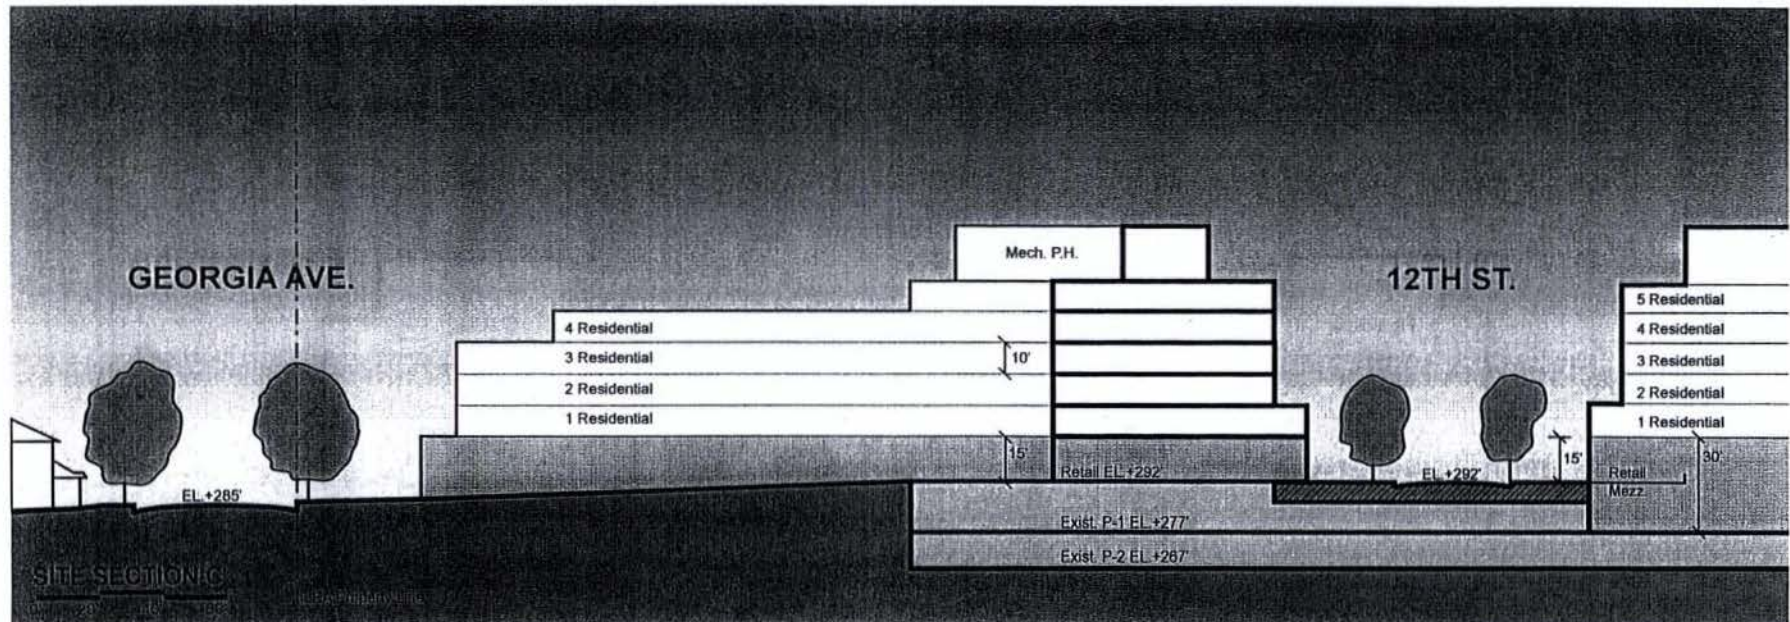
Town Center Site Section. Source: Perkins+Will.
